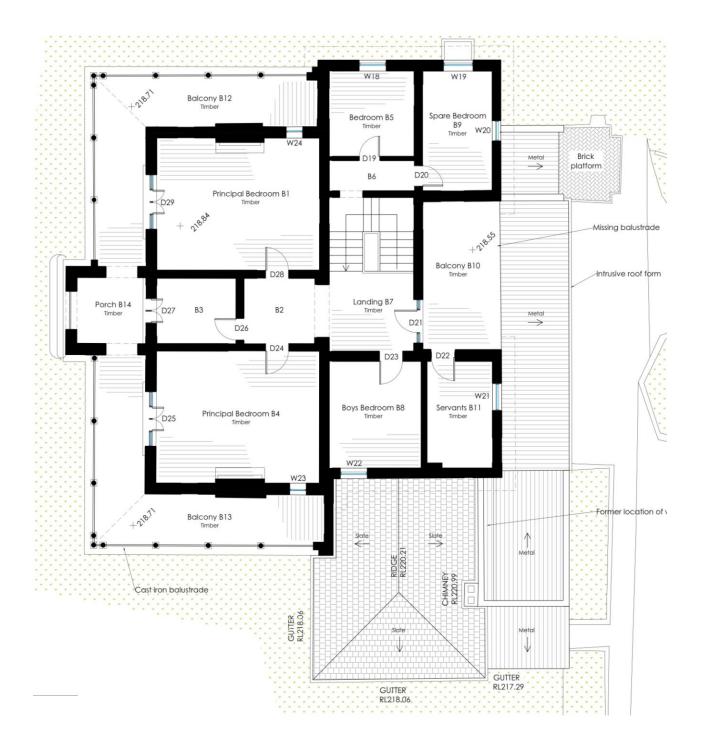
Existing First floor plan. Not to scale. Site measured and draw by TTA.
